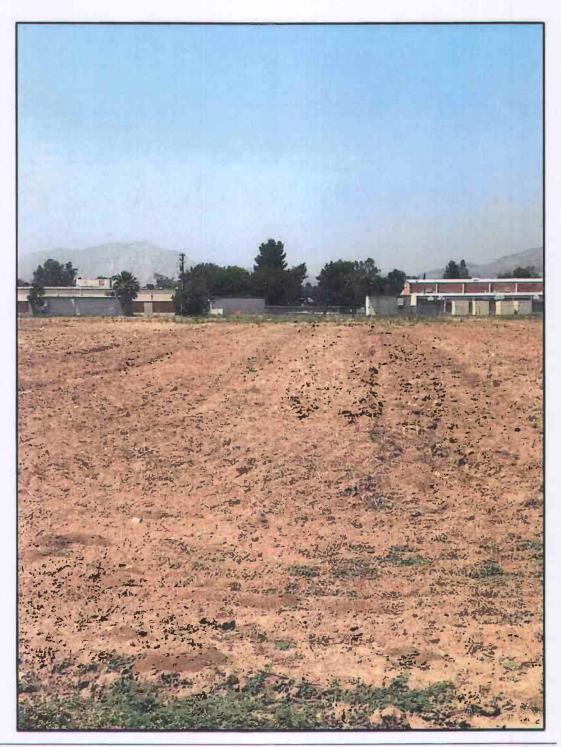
Site Photos - View Looking north across site from Cotton Wood Avenue
